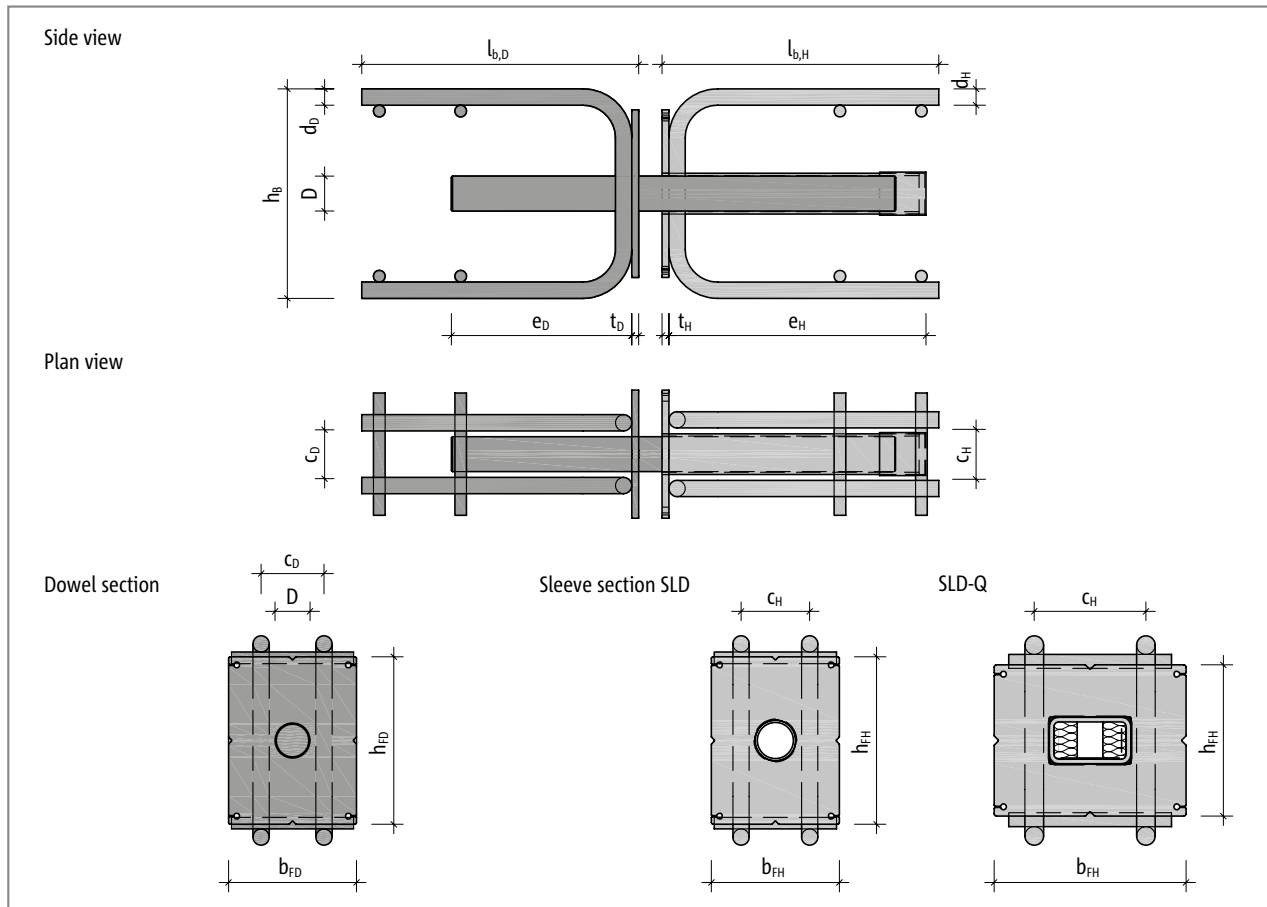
Schöck Dorn type SLD 40 bis SLD 80: Dimensions
